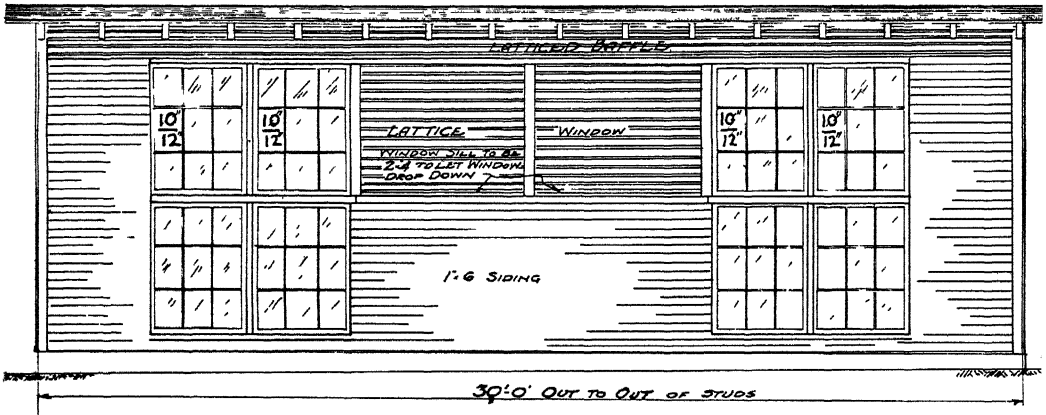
Front elevation. Details of the latticed baffle and latticed windows are shown on page 13. The lattice windows slide up and down. The baffle at the top is stationary.
